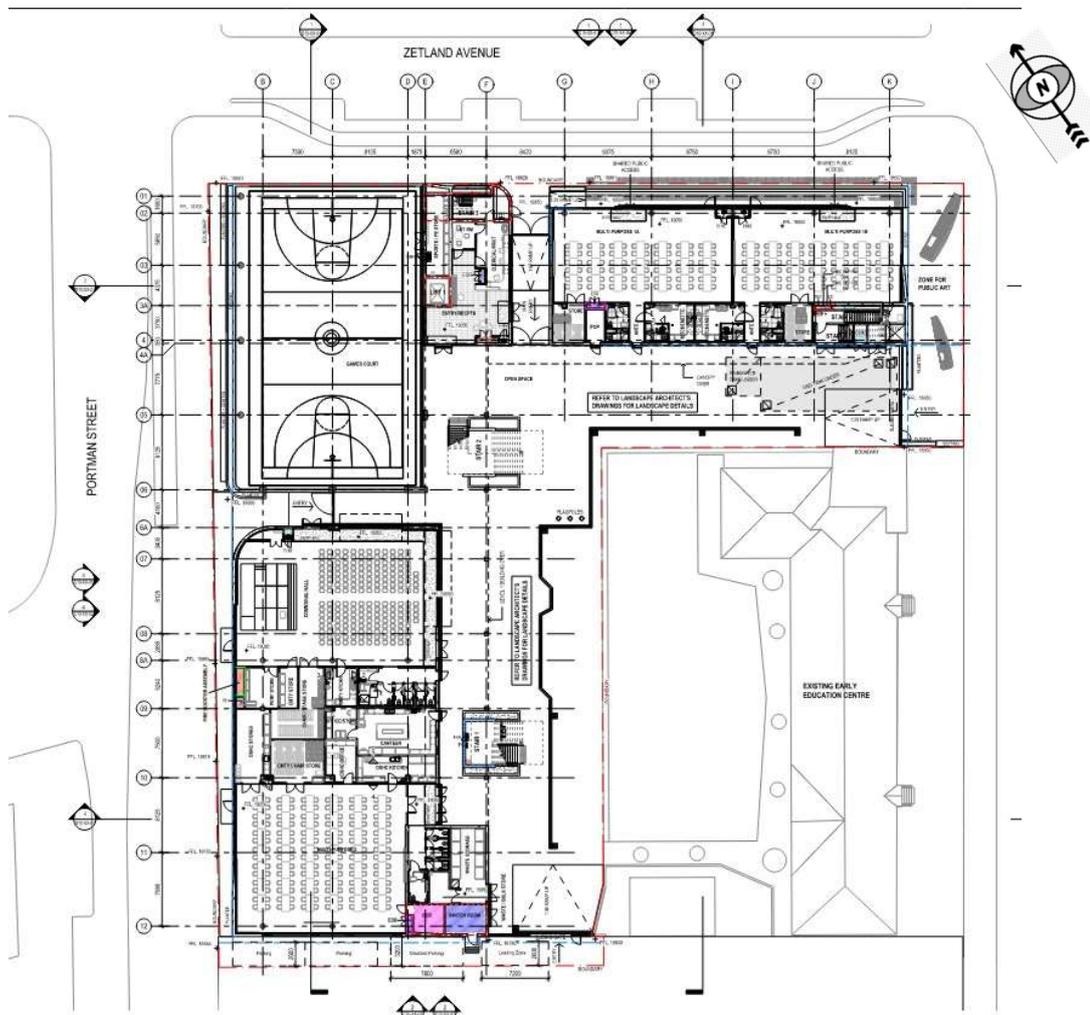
Architectural Ground Floor Plan (by BVN dated 12th March 2021)
